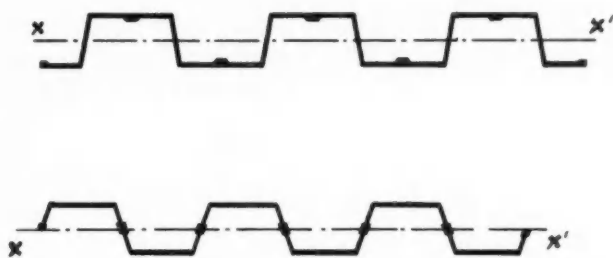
Sections and joints of "Z" and "U" corrugated steel sheet piling.
